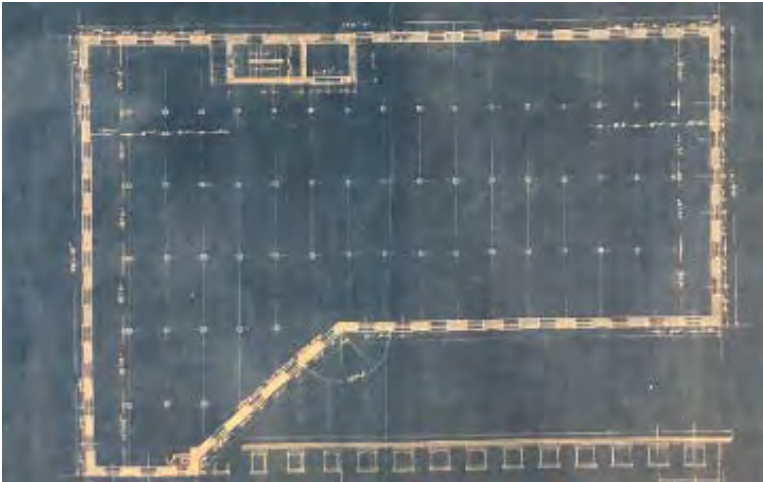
Mill #2 Plans c.1900 Dean & Main, engineers, American Woolen Company, Beaver Brook Mills Storage Building, Dracut, MA, plans and elevations, (1900) Mass. Dept of Public Safety Records, #6327, Massachusetts Archives.
